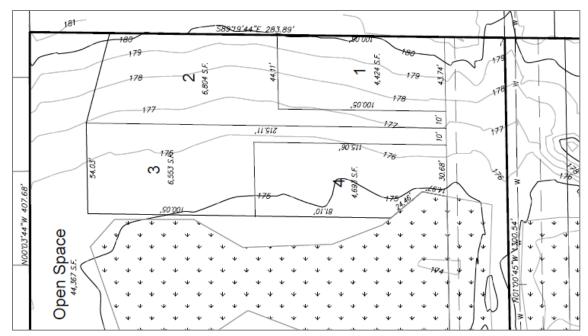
PRE 21-25 draft subdivision plan
